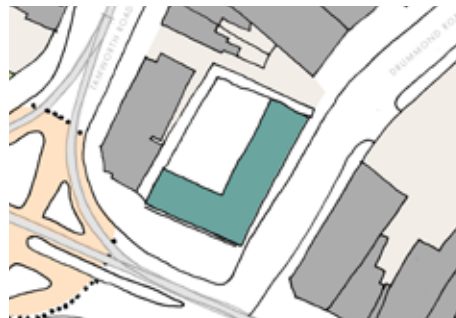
Sketch of the new building on Drummond Road turning the corner to Reeves Corner.
